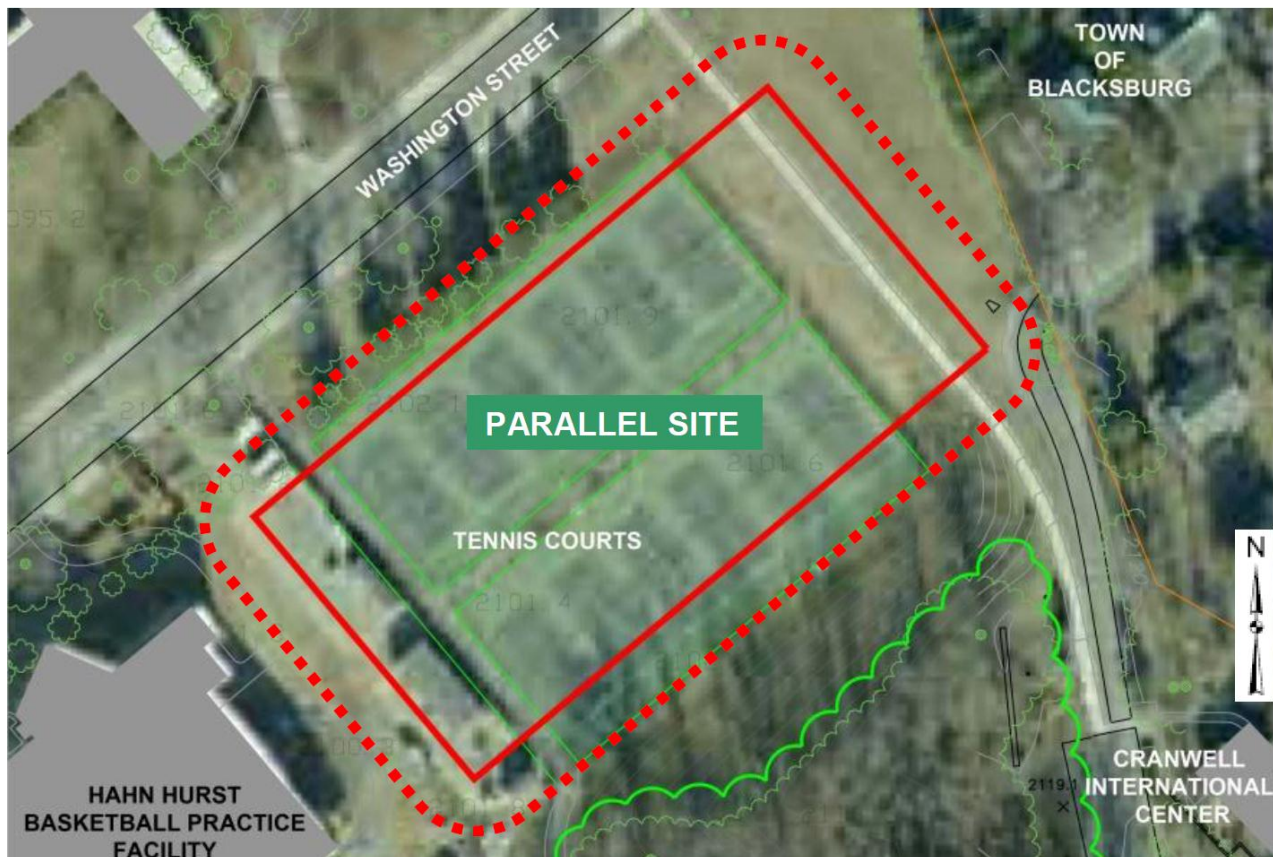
Parallel Site showing 208'x400' building footprint + 40' construction setback.
